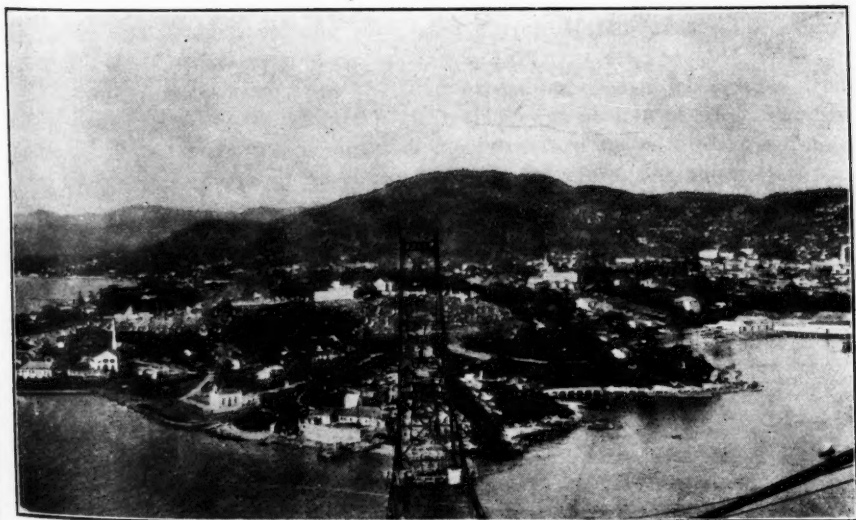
VIEW FROM TOP OF CONTINENT TOWER LOOKING EAST TOWARD THE ISLAND, FLORIANOPOLIS BRIDGE.
